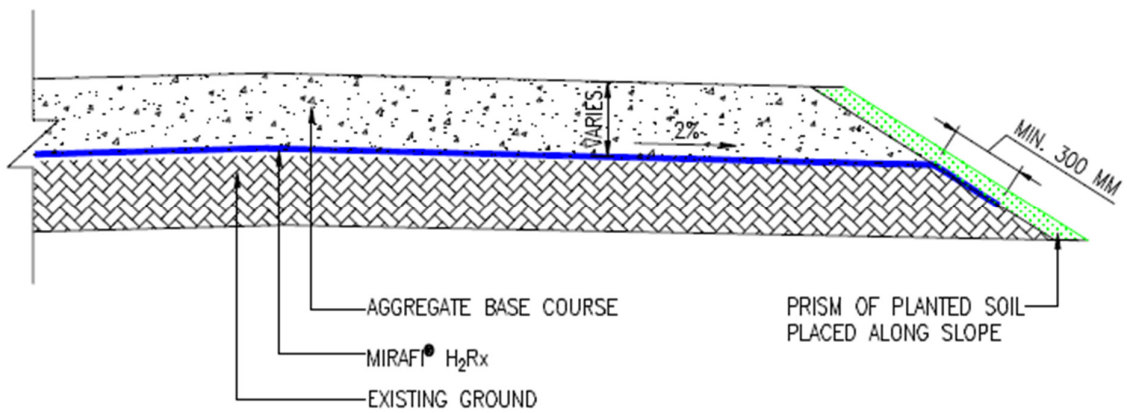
(a): A typical cross section diagram for geotextile edge terminated as a draped tongue beneath a bio-wicking vegetated soil cover.
